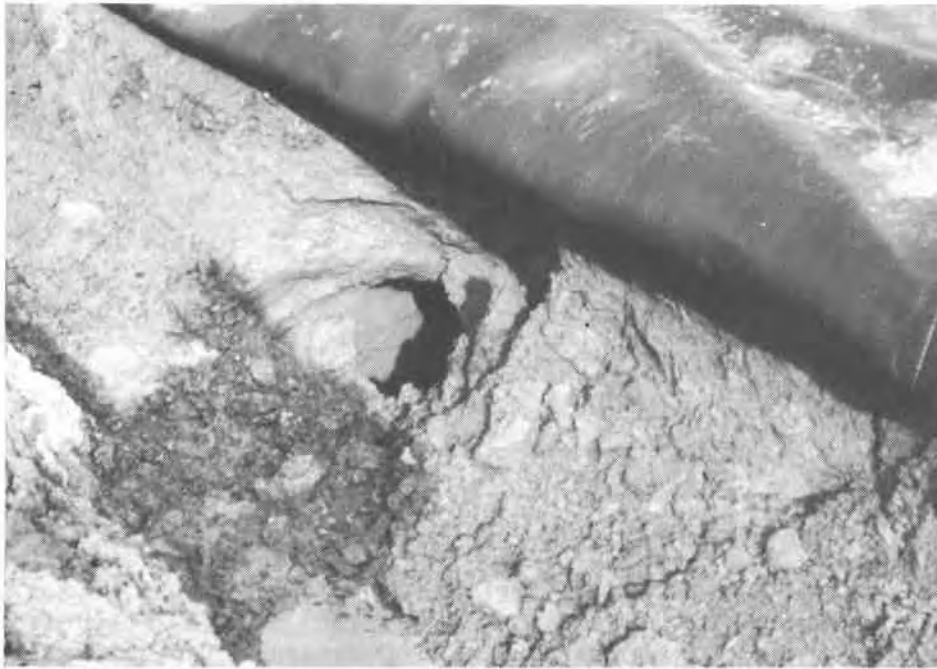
Typical Sinkhole in Taxiway Subgrade Soil
